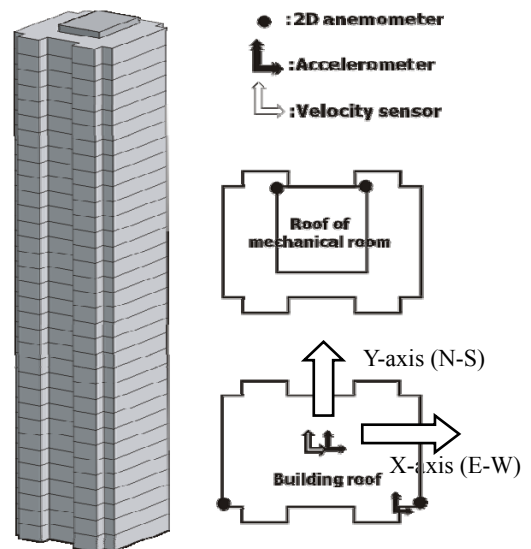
Configuration of Bai-Shi Building and Measuring Instrumentation
